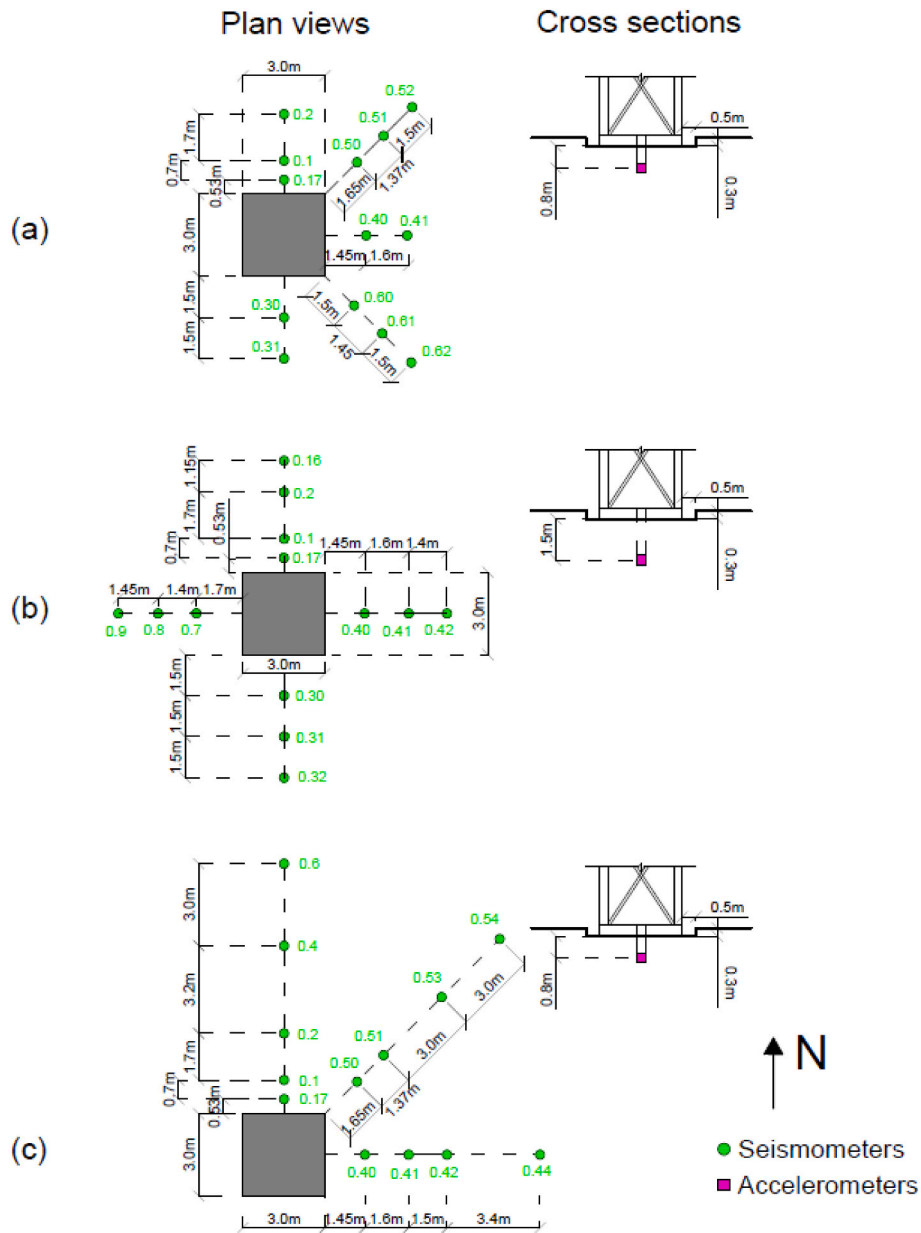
Plan views of the three configurations of soil instruments placed on the soil surface and downhole
